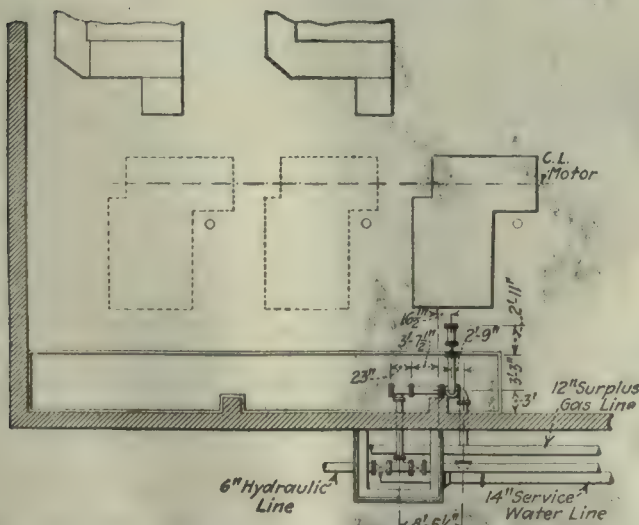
FLOOR PLAN OF SECTION OF SHOP
